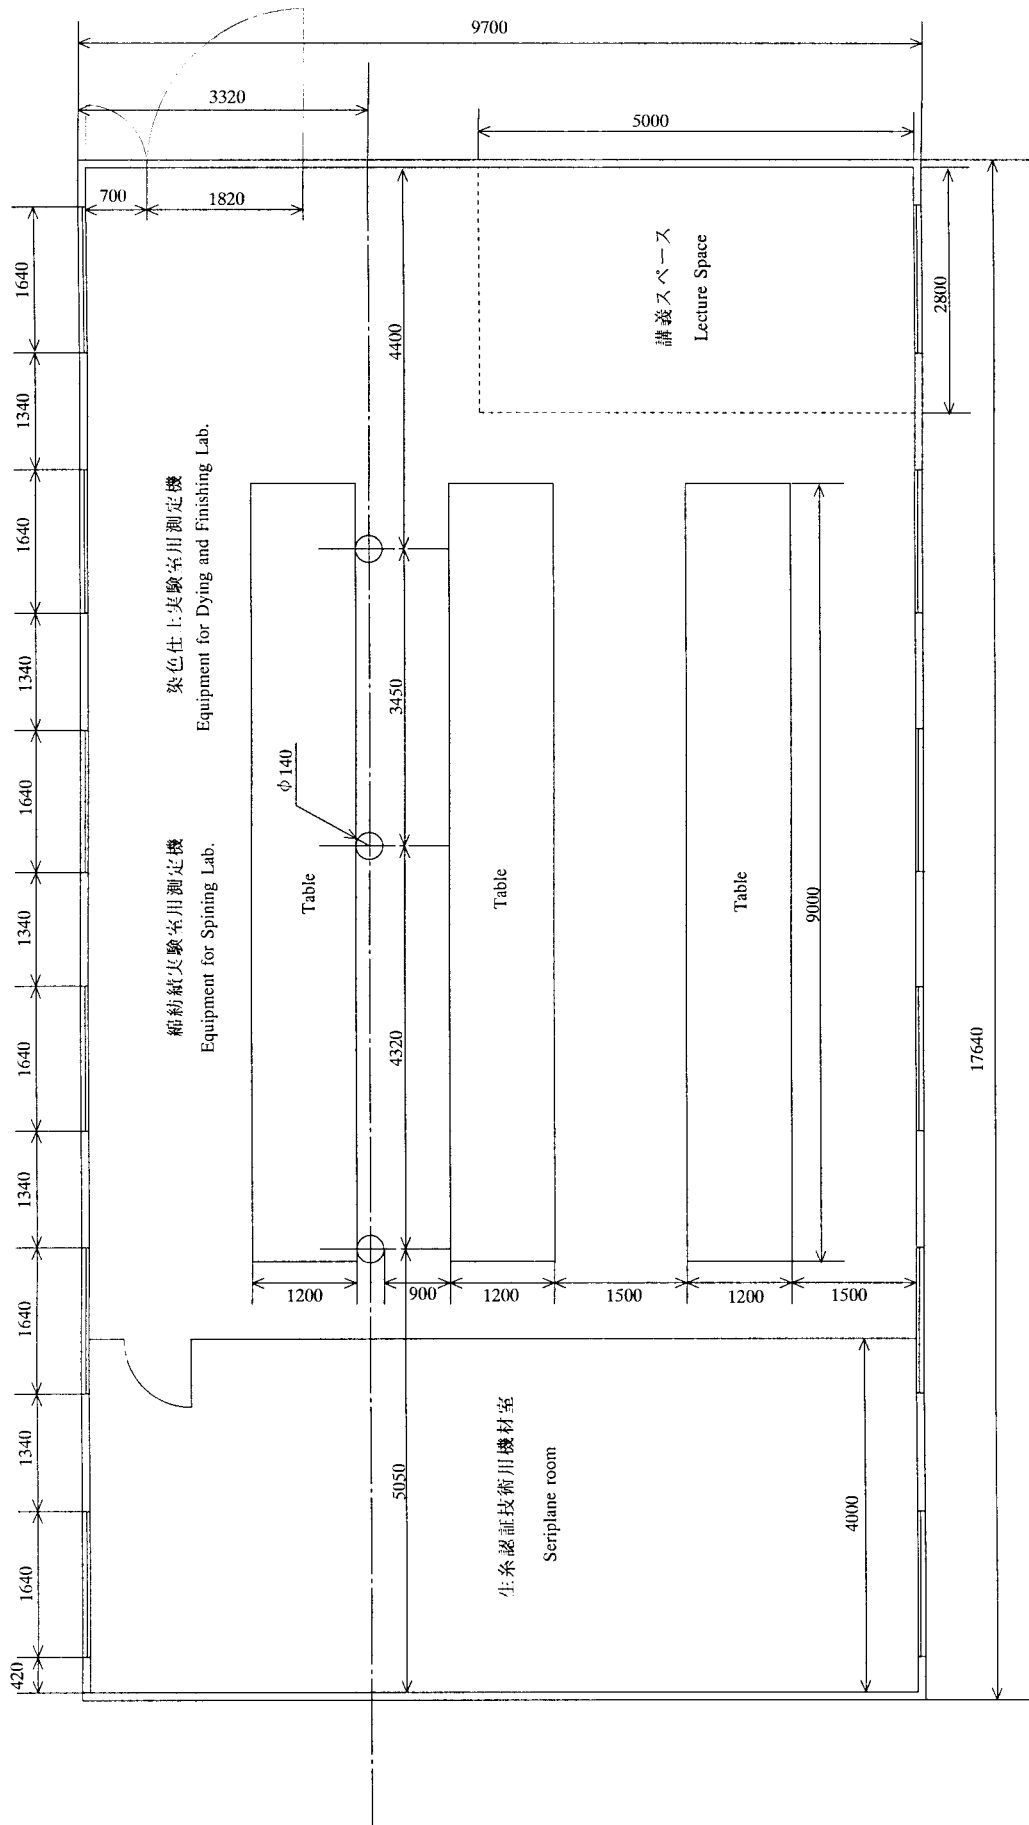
Layout Plan (2) Textile Products Testing Laboratory (No. 1)
